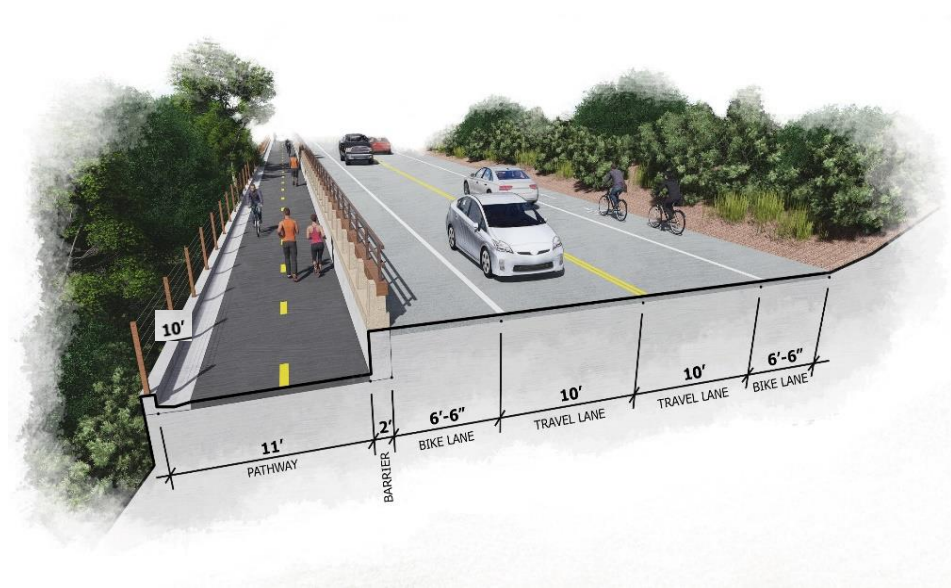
Illustration of roadway section on the lower portion of Las Positas Road
